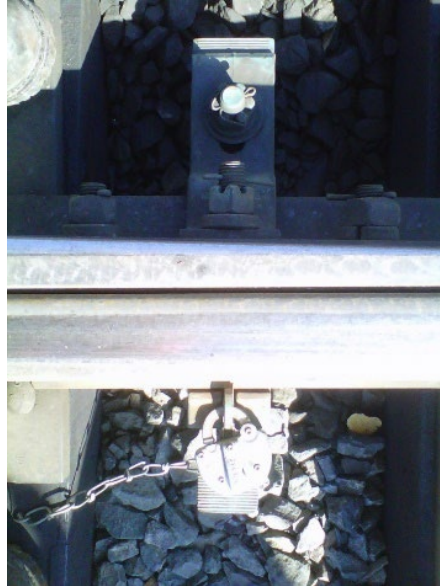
Figure SUB-PART D – 71 – Switch Point Foot Pedal Lock
